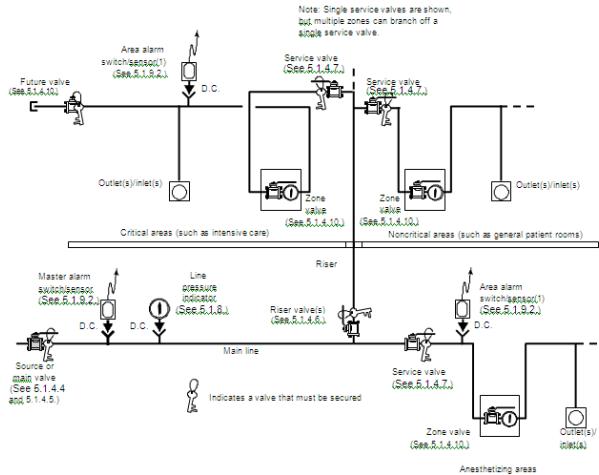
Arrangement of Pipeline Components.
